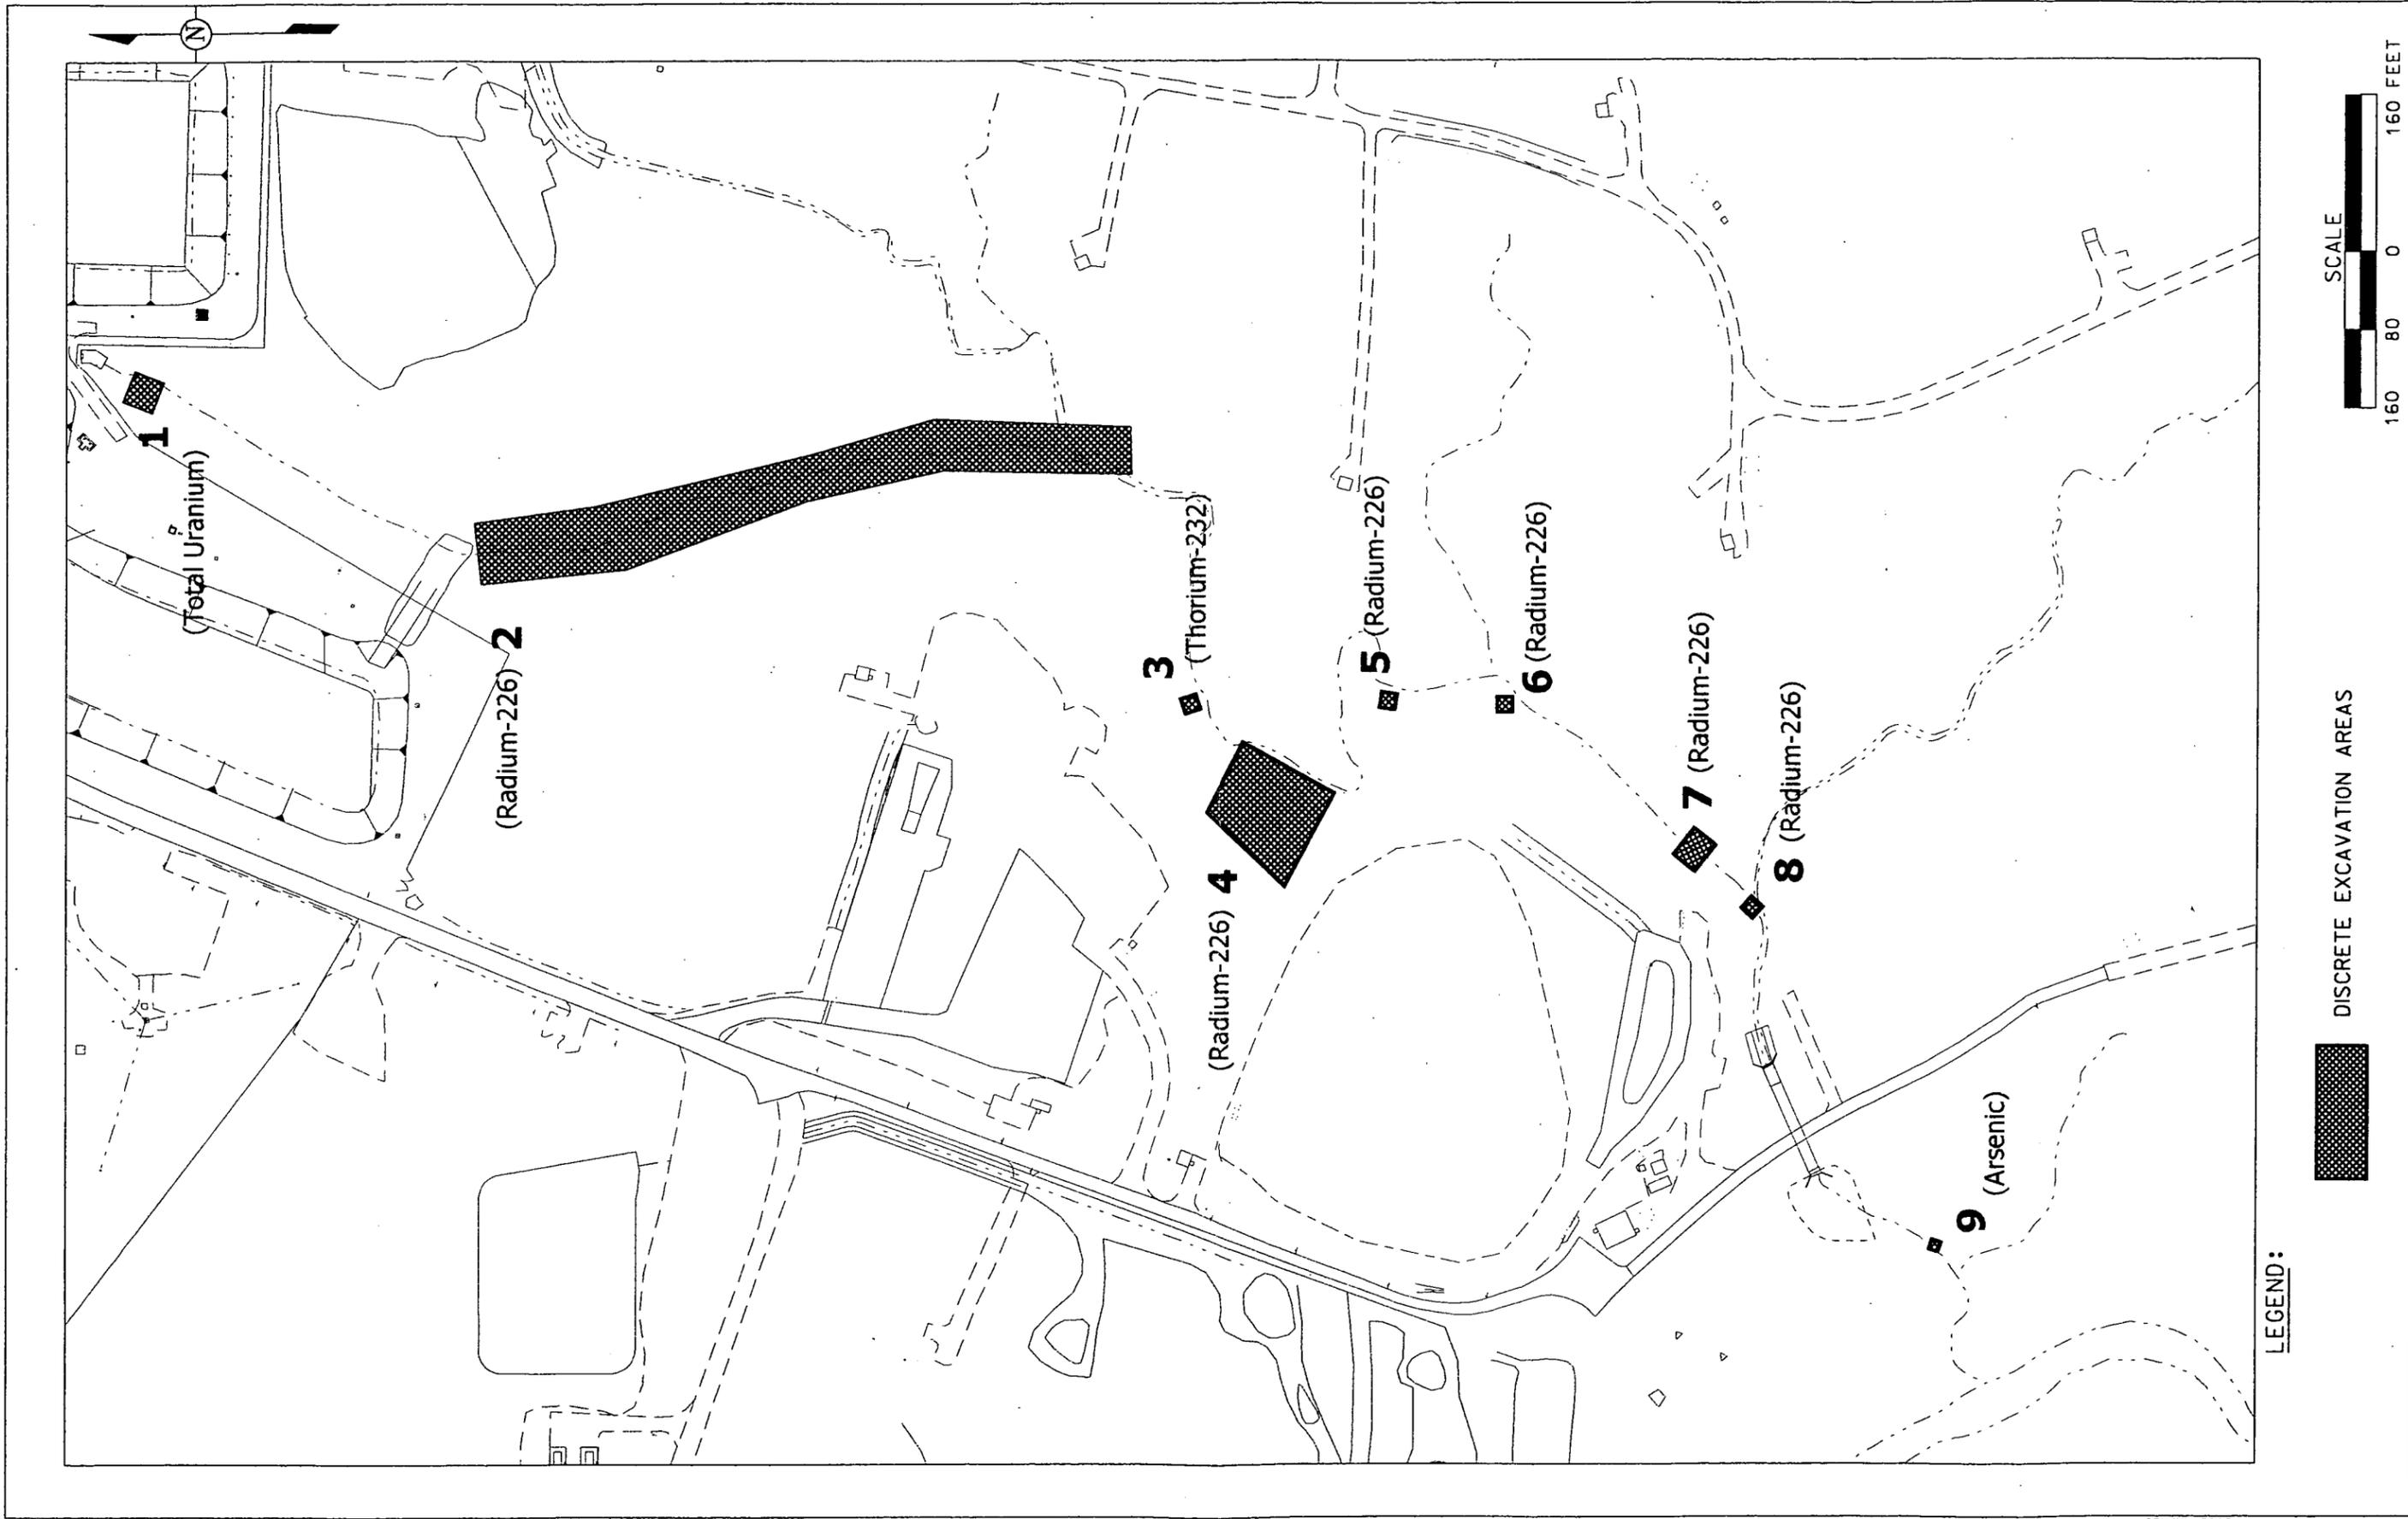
STORM SEWER OUTFALL DITCH - EXCAVATION CONTROL AREA
